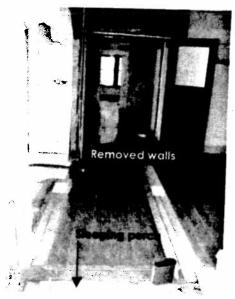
Bedroom at rear of house - second floor. Note green areas which demarked separate room and hall to sleeping porch.
